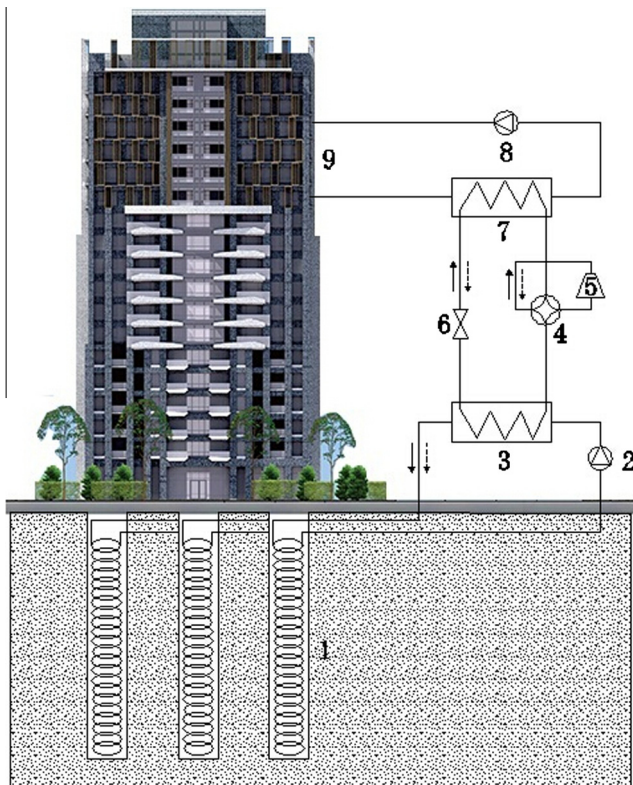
Schematic diagram of a GSHP system with PGHEs (1. PGHE with spiral coils; 2, 8 circulation pump; 3, 7 condenser and evaporator; 4 reversing valve; 5 compressor; 6 expansion valve; 9 terminal units).
